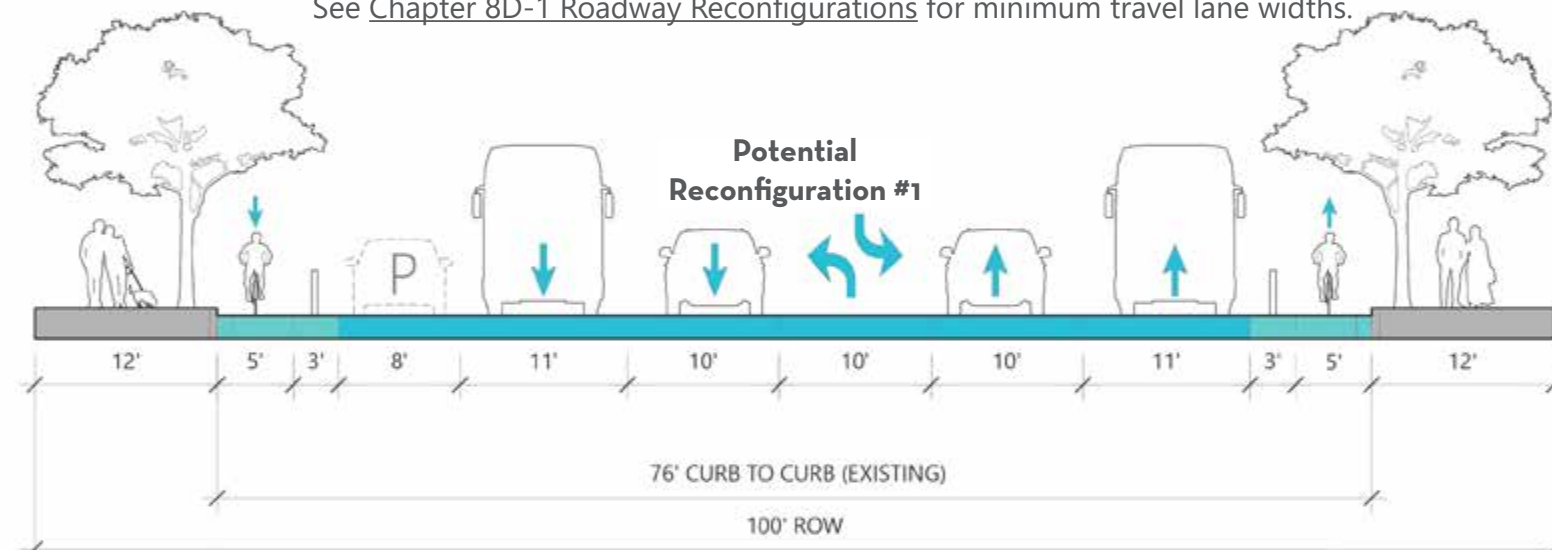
Proposed Reconfiguration #1: One-Way, In-Street Class IV Bikeway on a Major Arterial Street.
